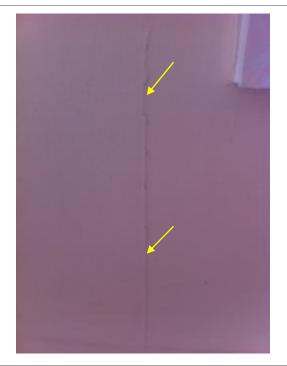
Vertical Hairline Crack on North Wall of L1 Main Room
